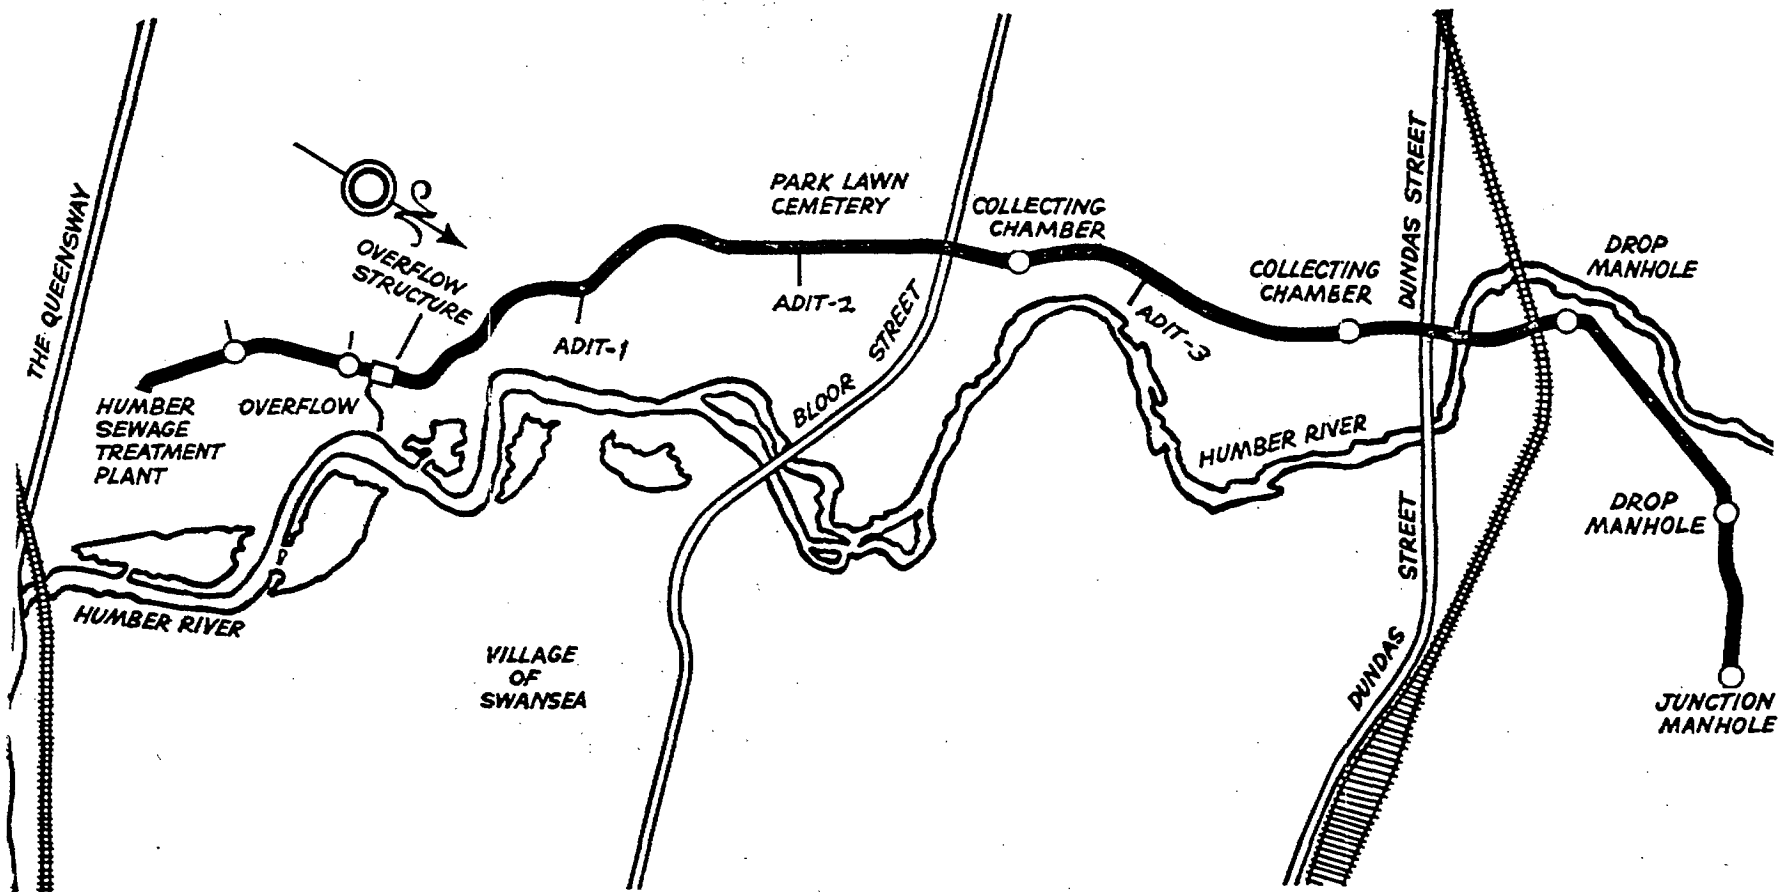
An overall plan of the "Foundation Humber" tunnel route, showing the location of the three adits.
